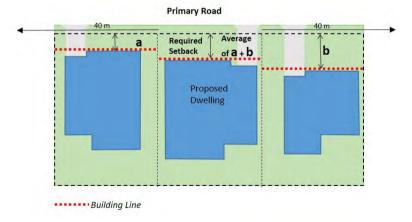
HOW TO MEASURE FRONT BUILDING SETBACKS
